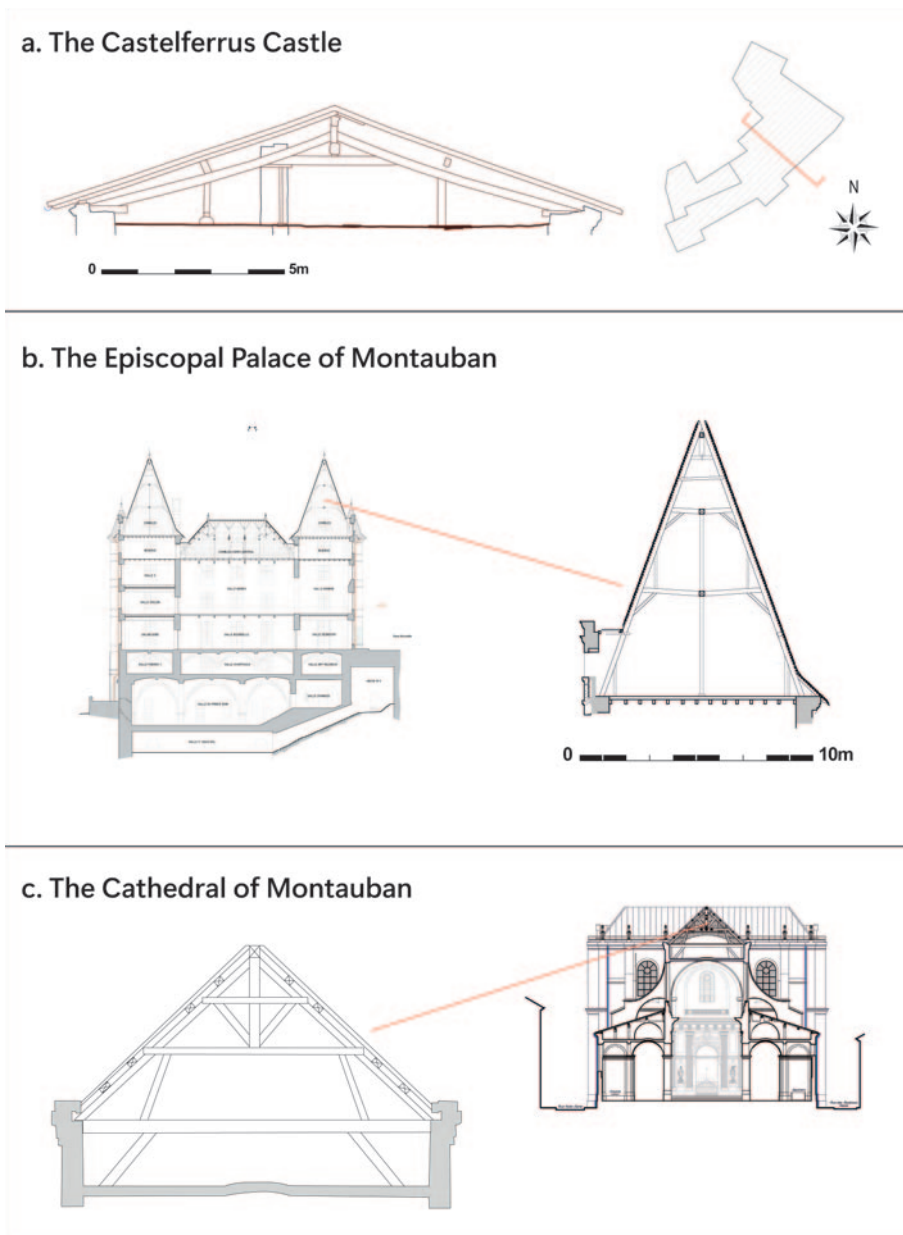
Plans and sections of the buildings and the roofs included in this study. (a) The Castelferrus Castle: plan of the building and transverse section through the studied roof (Duchêne, Rousset 2024); (b) the Episcopal Palace of Montauban: transverse section through the pavilions and the main body of the palace (credits: Jean-Louis Rebière, ACMH); (c) the Cathedral of Montauban: transverse section through the nave facing the choir (credits: Jean-Louis Rebière, ACMH).
